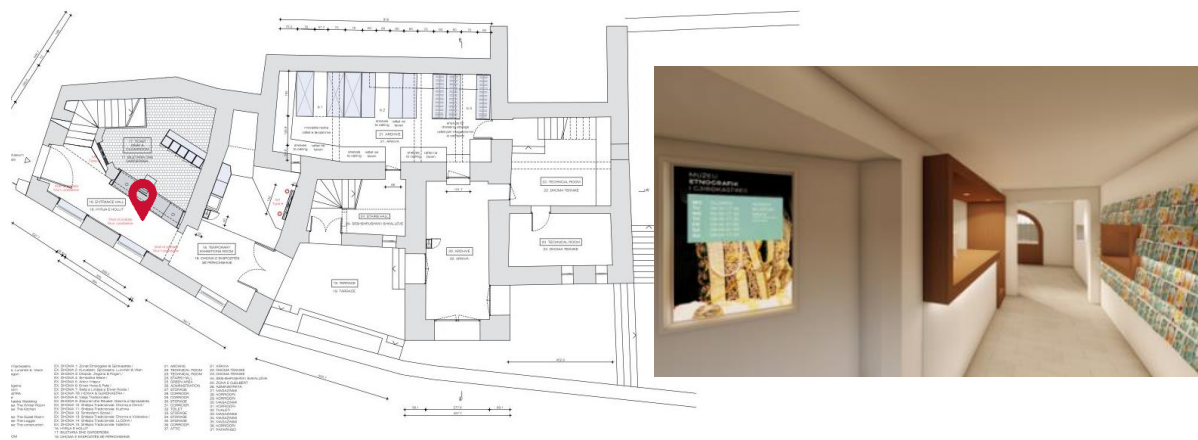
Plan of the ground floor, Floorplan designed by Casanova+Hernandez.
